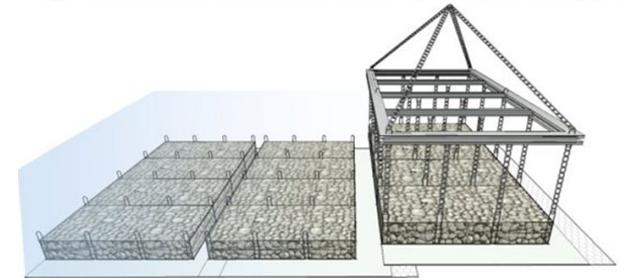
Prefilled Reno mattress®: single unit and installation detail
